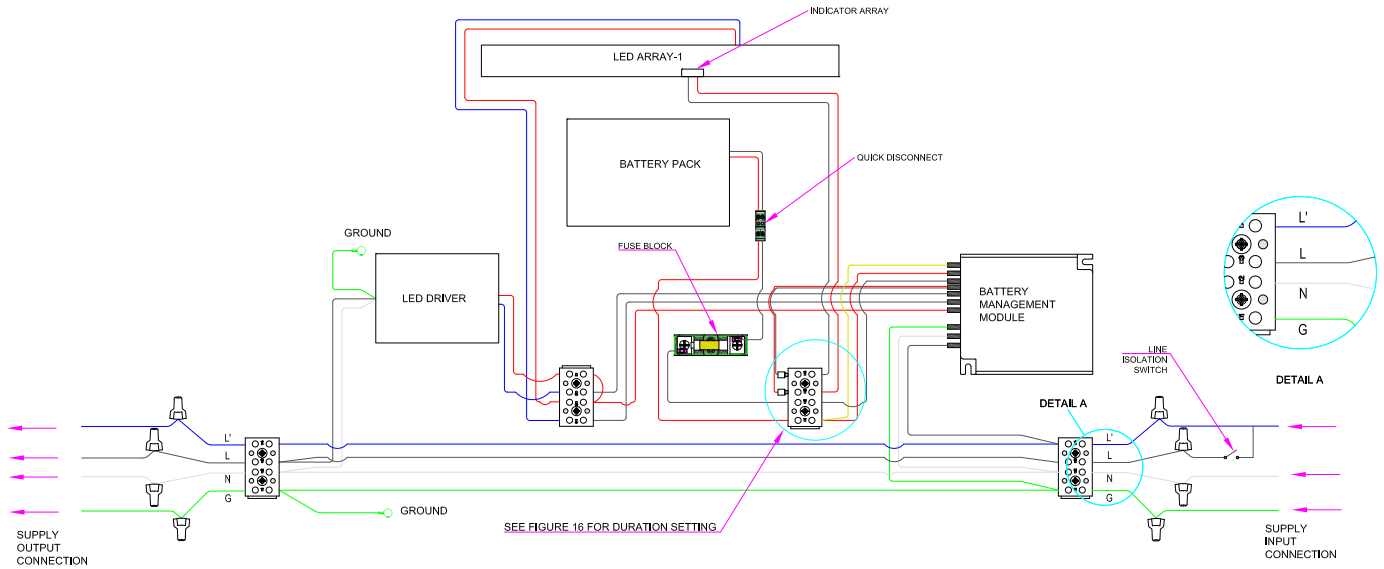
A: THROUGH FEED WIRING 4 WIRE CONNECTION LAYOUT WITH WIRE NUTS: 2FT
